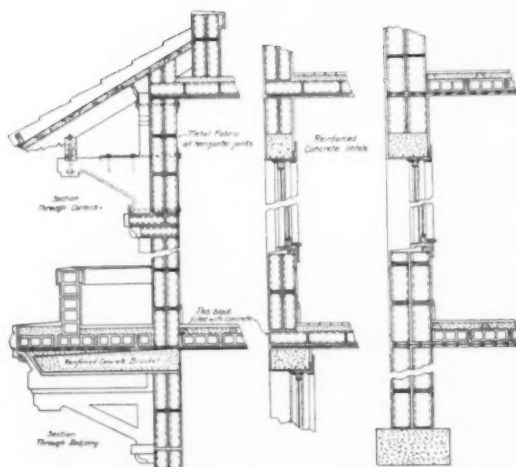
Constructional Details of Mr. Bergstrom's Residence at Los Angeles, Cal.
